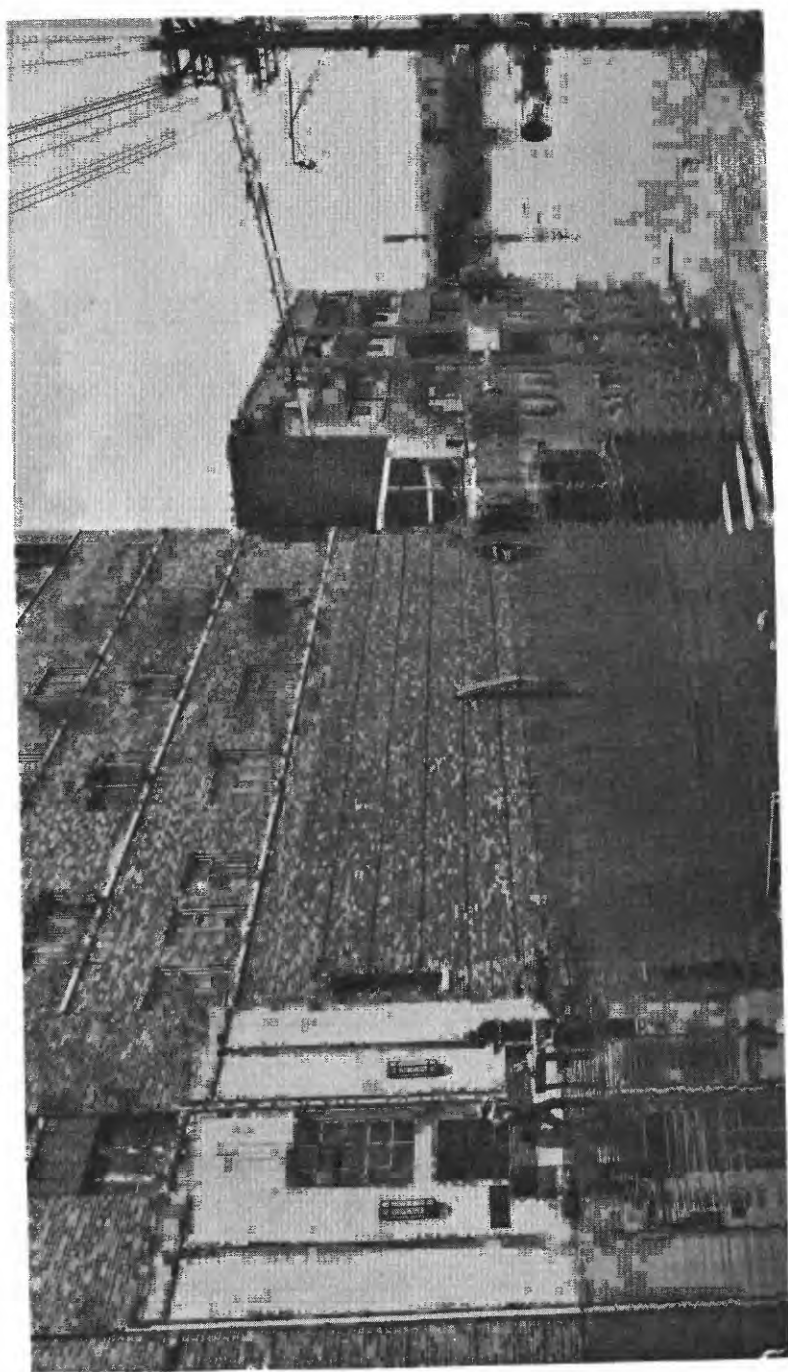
Masonry barricade against flood constructed at entrance to Dubuque Packing Co. Photograph by Corps of Engineers.
